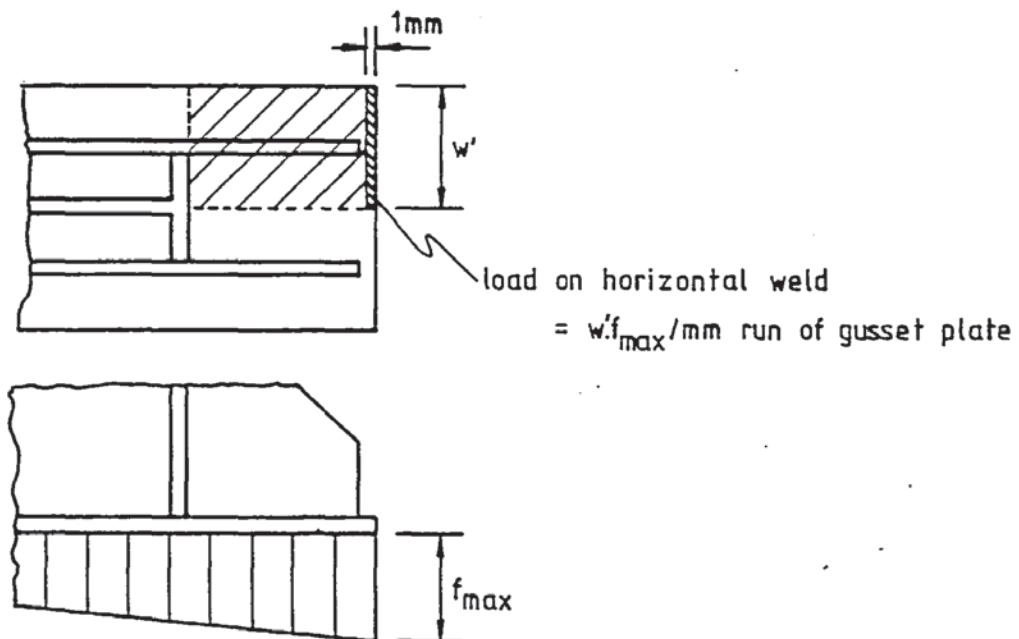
Max stress on horizontal weld of gusset plate as assumed by MacGinley.
